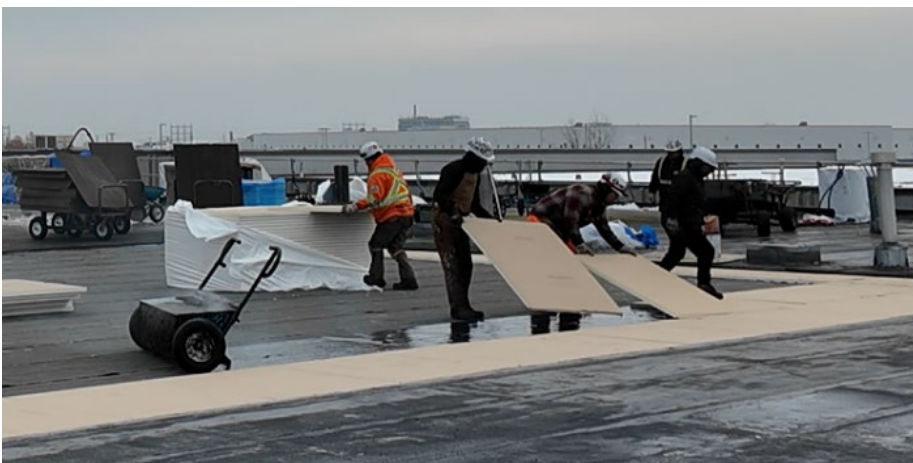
Construction ICI roofers performing *installation of insulation* task.
